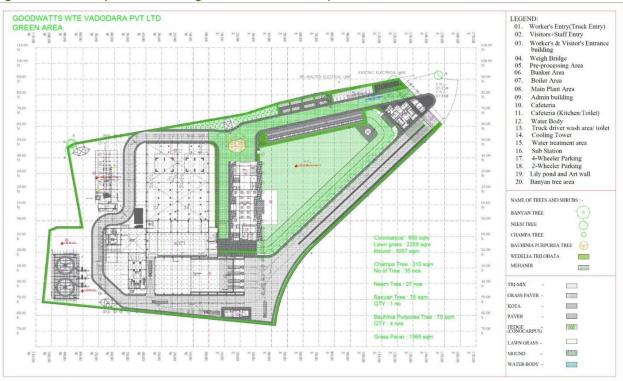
Layout Plan showing Greenbelt and Landscape area
